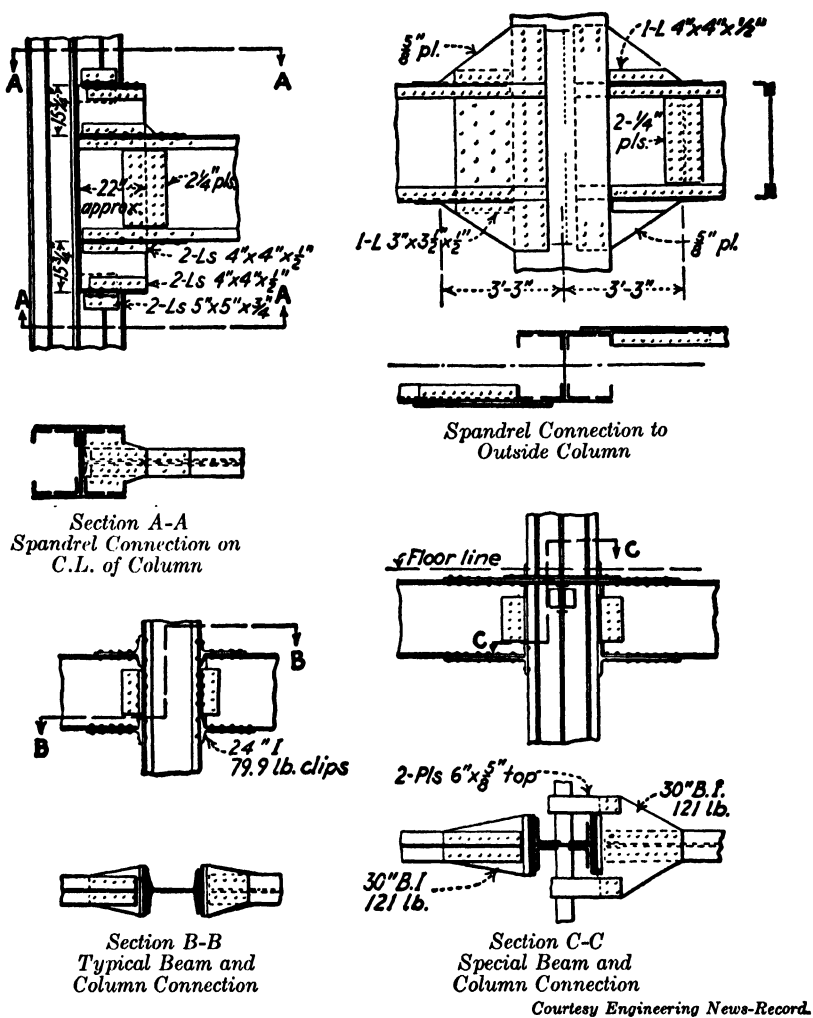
TYPES OF WIND BRACING CONNECTIONS, UNION TRUST BUILDING, DETROIT.
